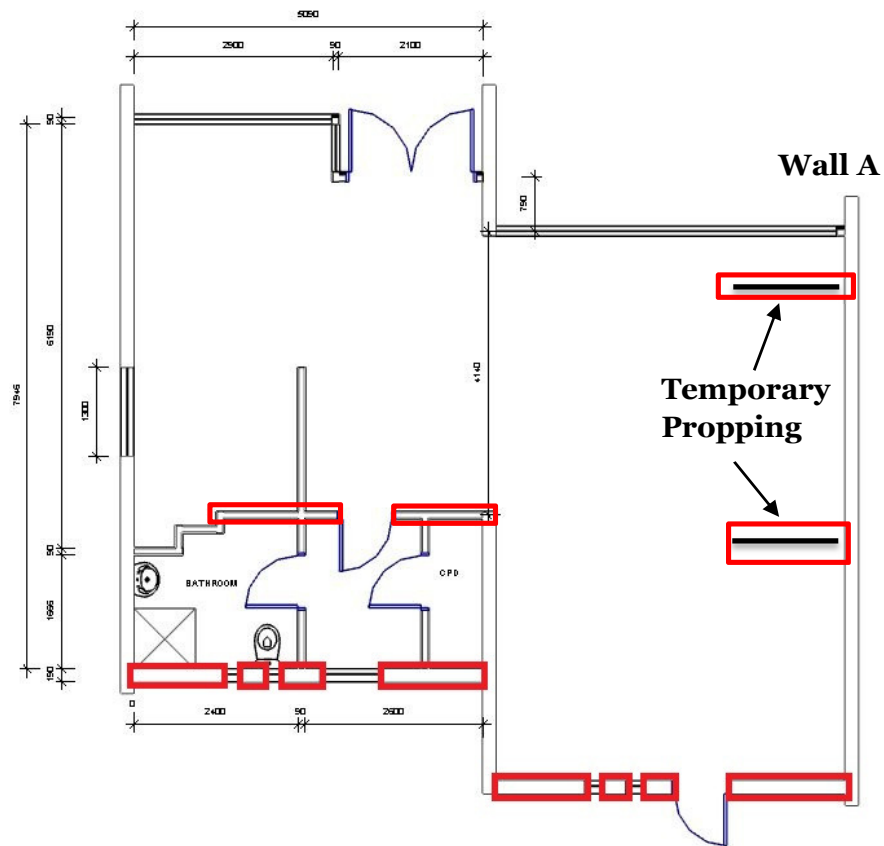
Walls used for bracing in the longitudinal direction Residents Lounge.
